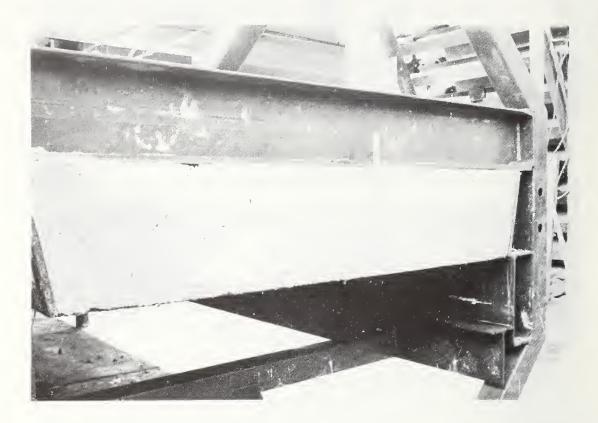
SELF-SUPPORTING SLIPFORMED SLAB
